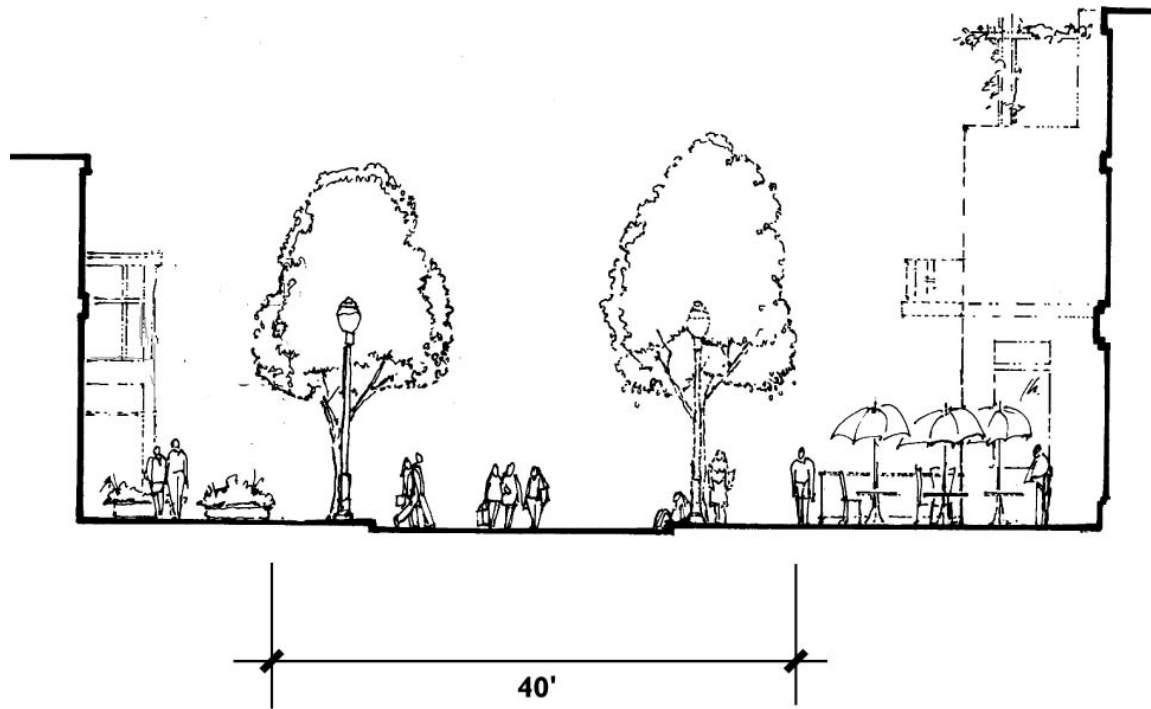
Pedestrian-Oriented Walkways With Building Setbacks
